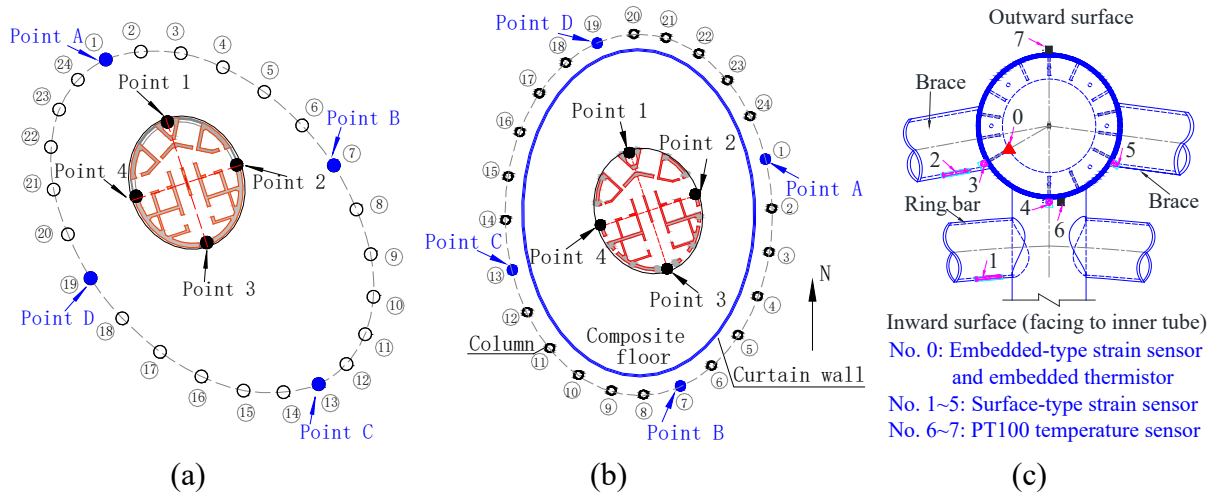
Layout of sensors on the monitoring sections: (a) Section 3, (b) Section 12, and (c) plan view of the CFT
